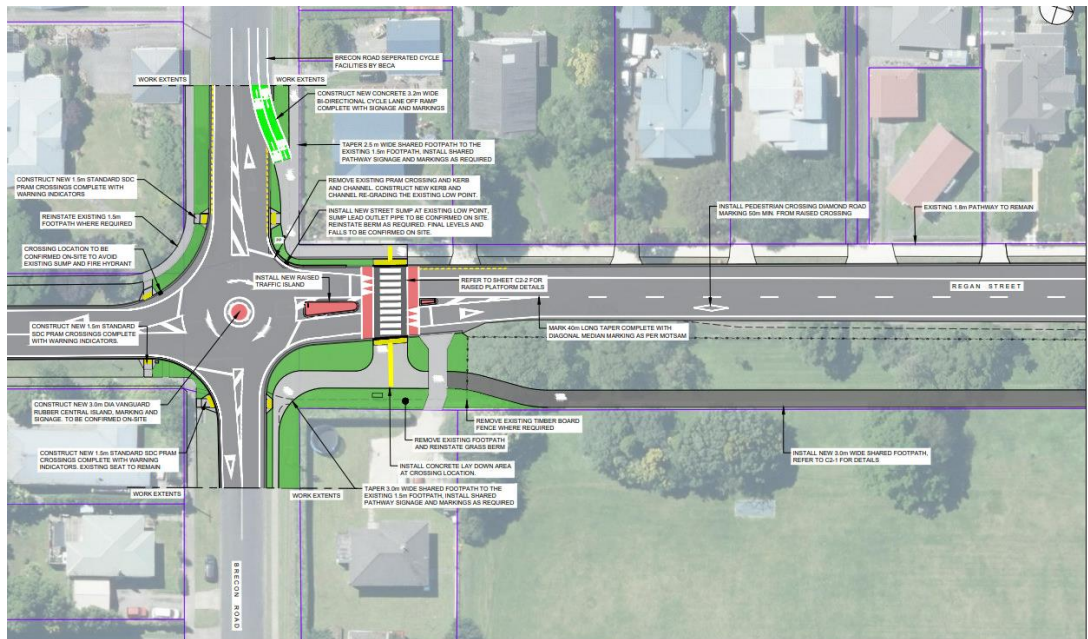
New Roundabout at Brecon Road/Regan Street intersection.
